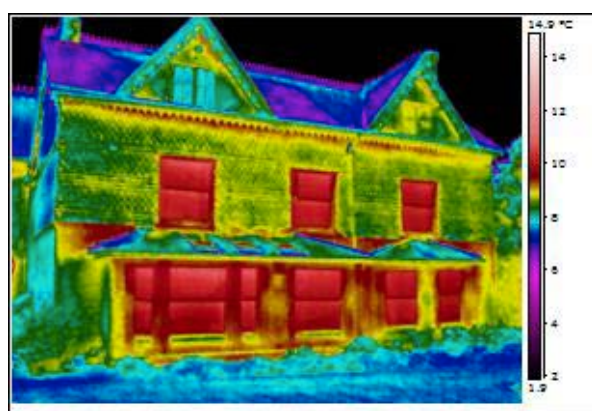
South elevation. The image shows the heat loss through roof-wall junction at the floor line of second floor.
